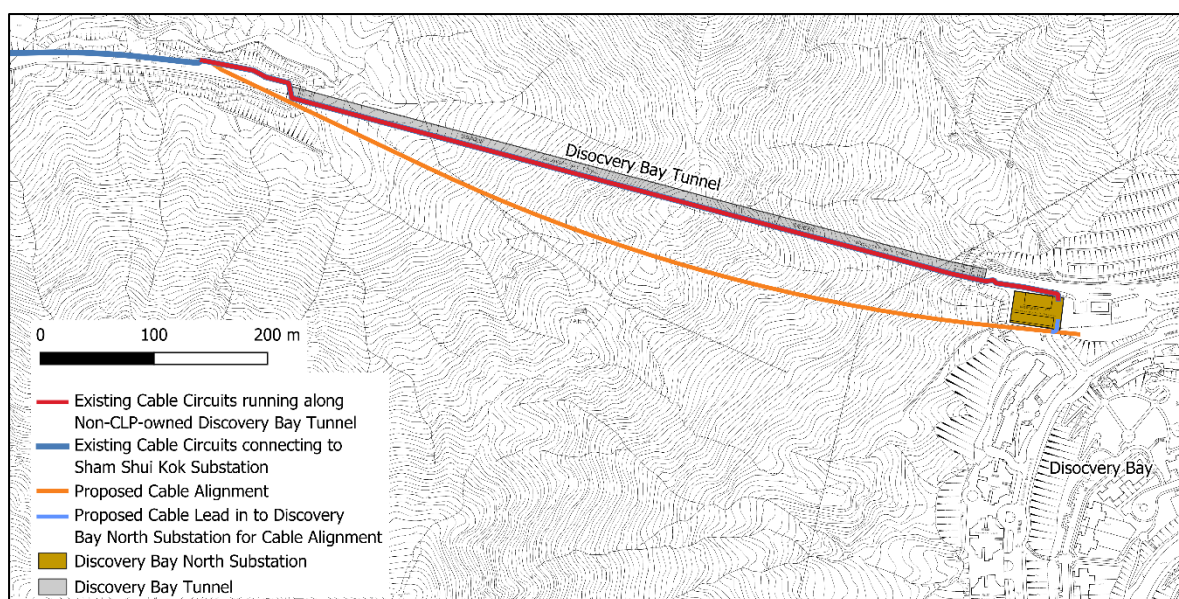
Existing Sections and Proposed New Cable Circuits running along Discovery Bay Tunnel
